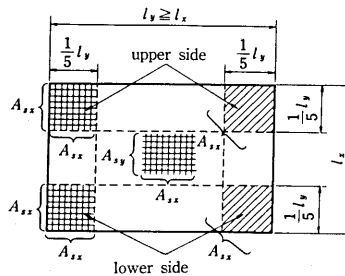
Minimum reinforcement at the corners of two-way slab
